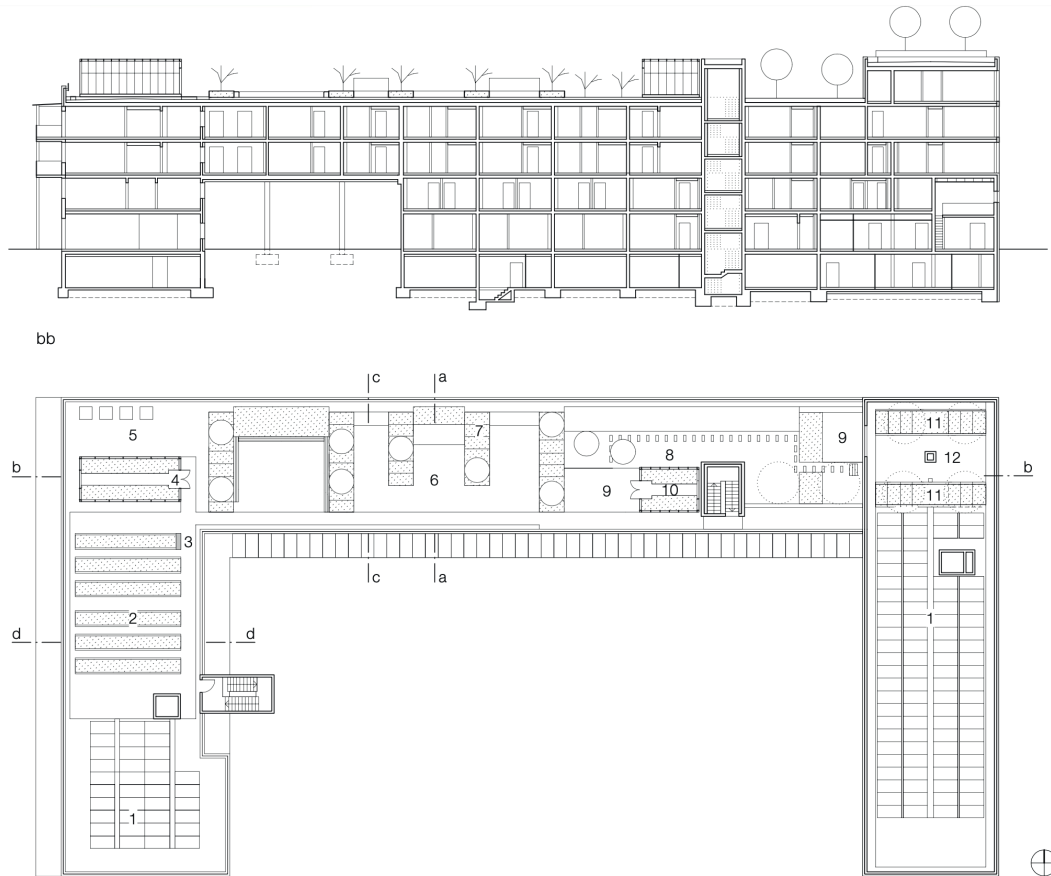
Section & Roof plan © a2 freising architekten + stadtplaner, Kai Krömer and Stefan Lautner
